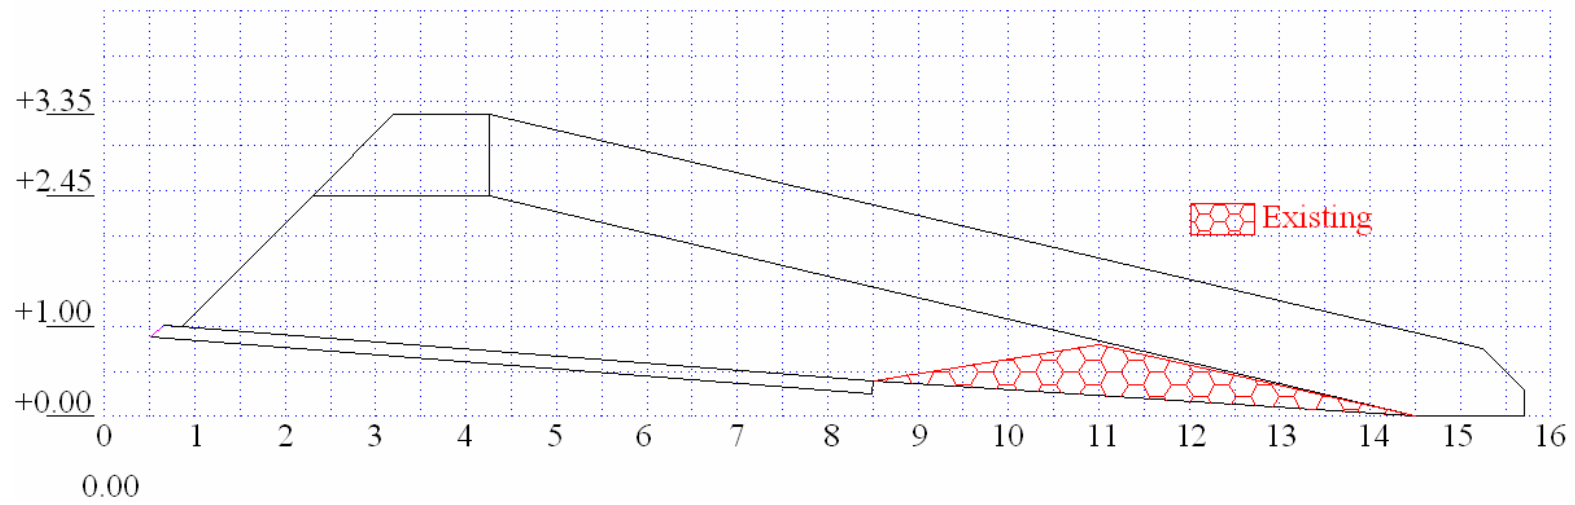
Existing and Proposed cross-section in Chettavai Azhi
